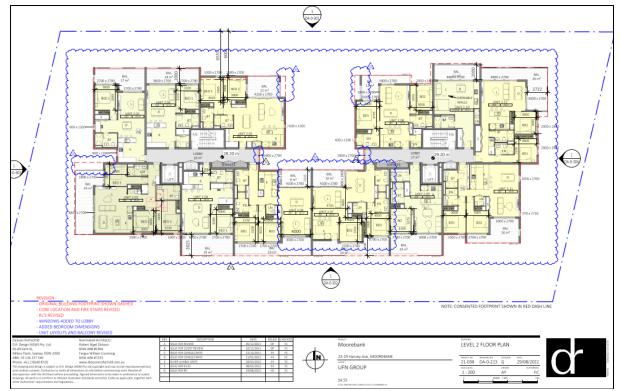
Level 2 Floor Plan - Revision G – S4.55
